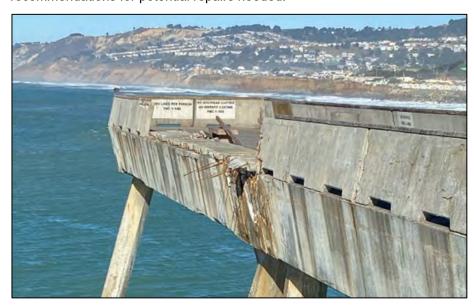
Damaged Pier Handrail (January 2021)
